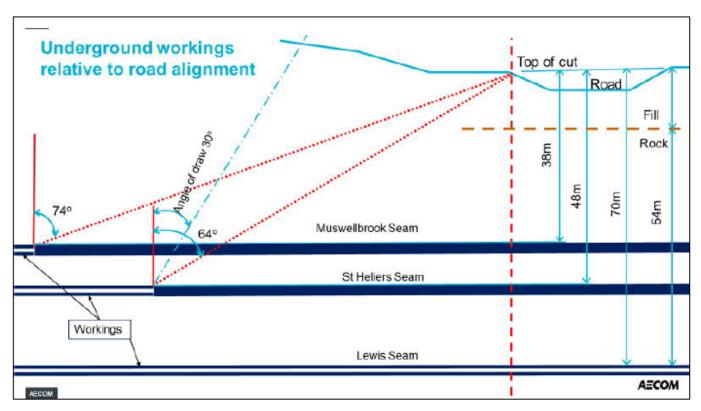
Former underground workings relative to the proposed road corridor/alignment
